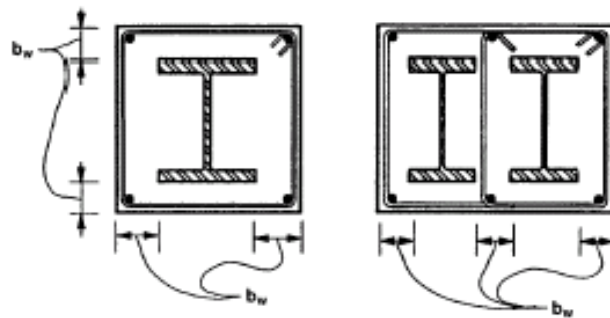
Effective widths for shear strength calculation of encased composite columns.
